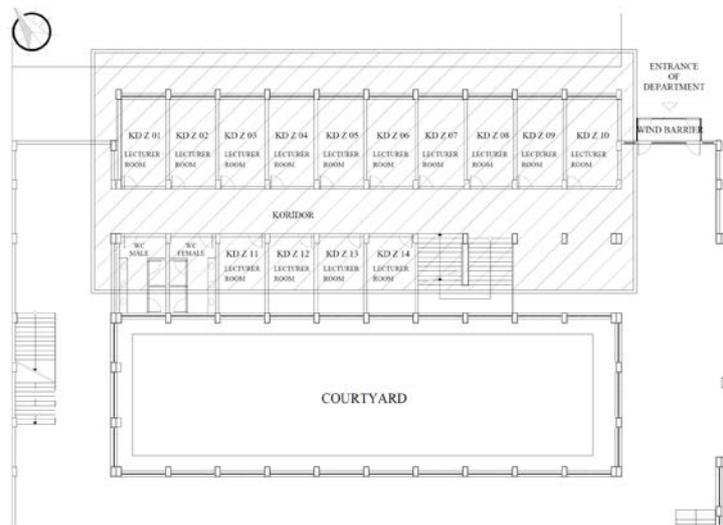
ESTU Industrial Engineering Department Ground Floor Plan
